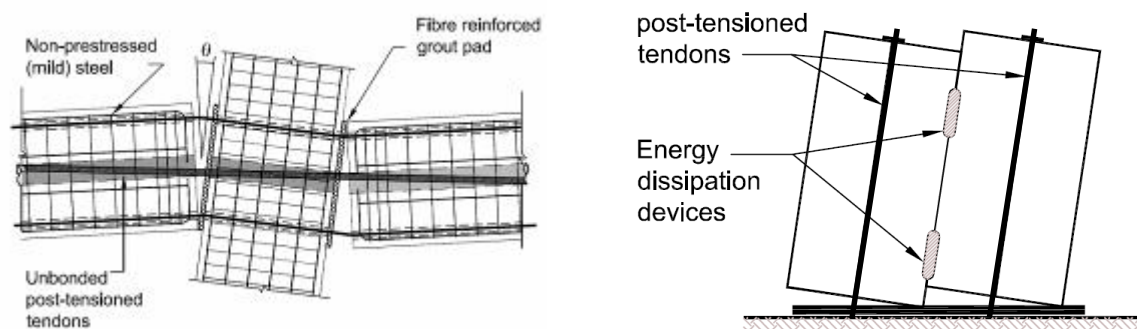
Jointed precast “hybrid” frame and wall systems developed in the PRESSS-Program (modified from fib, 2003; NZS3101:2006).
